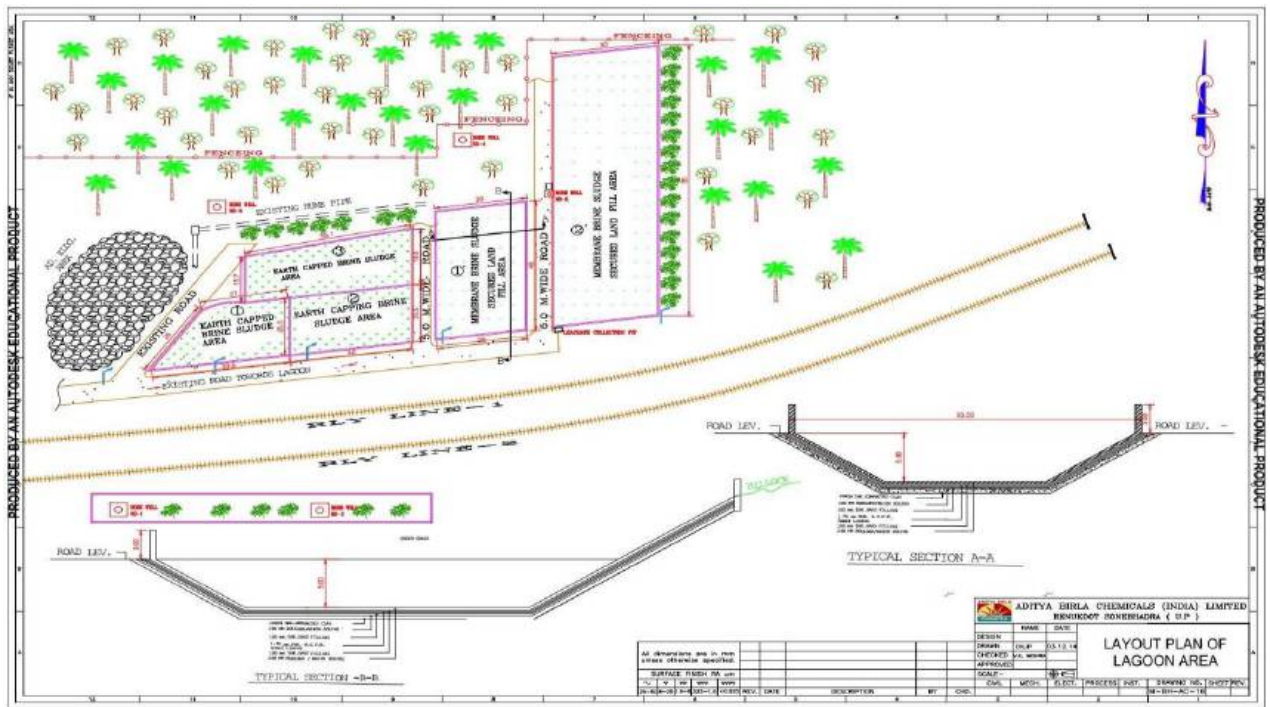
Layout of Secured Landfill Site at Chlor-Alkali Plant, Renukoot, Sonbhadra (U.P)
